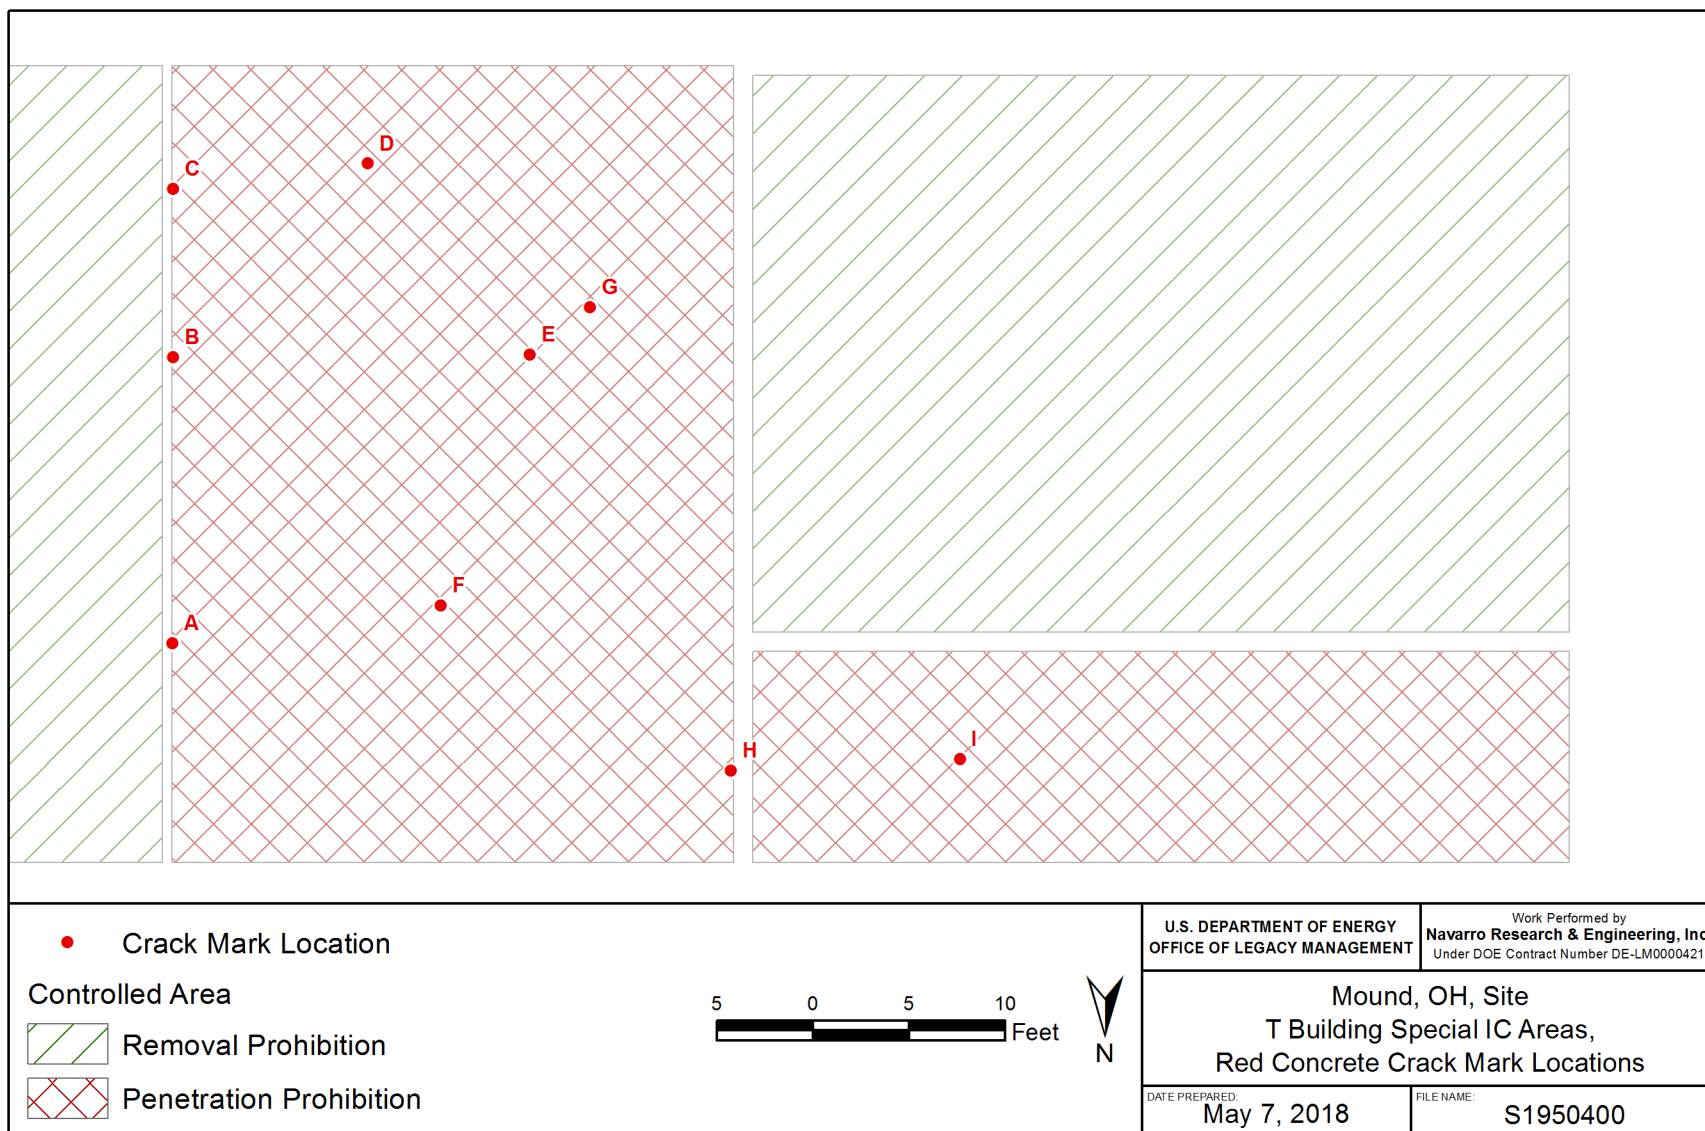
T Building Special IC Areas, Red Concrete Crack Mark Locations
